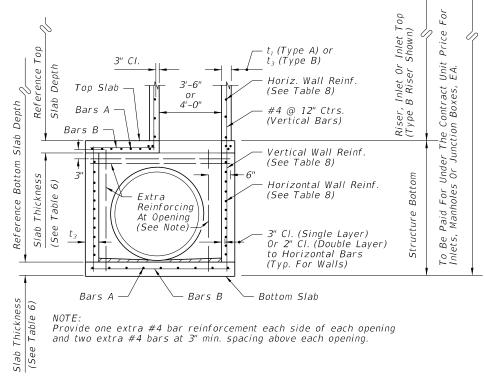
DETAILS FOR SKEWED PIPES IN RECTANGULAR STRUCTURES
